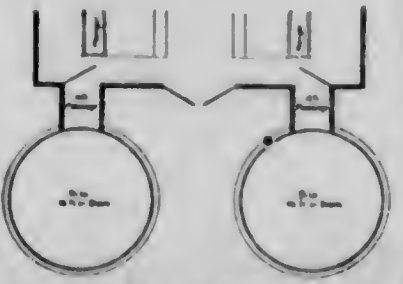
Plan of the Silos Showing a Convenient Arrangement.
